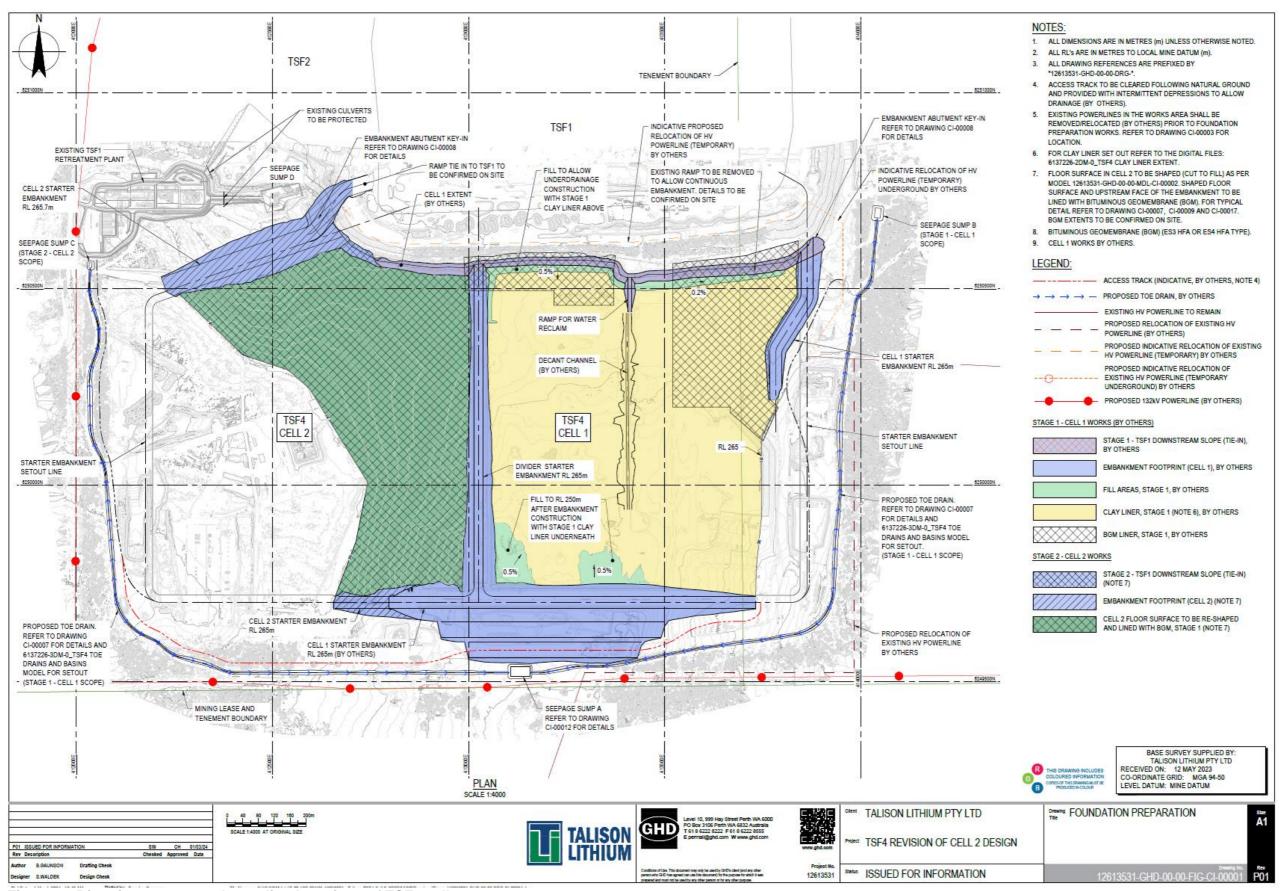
Bituminous geomembrane lined sections of TSF4 cell 2
